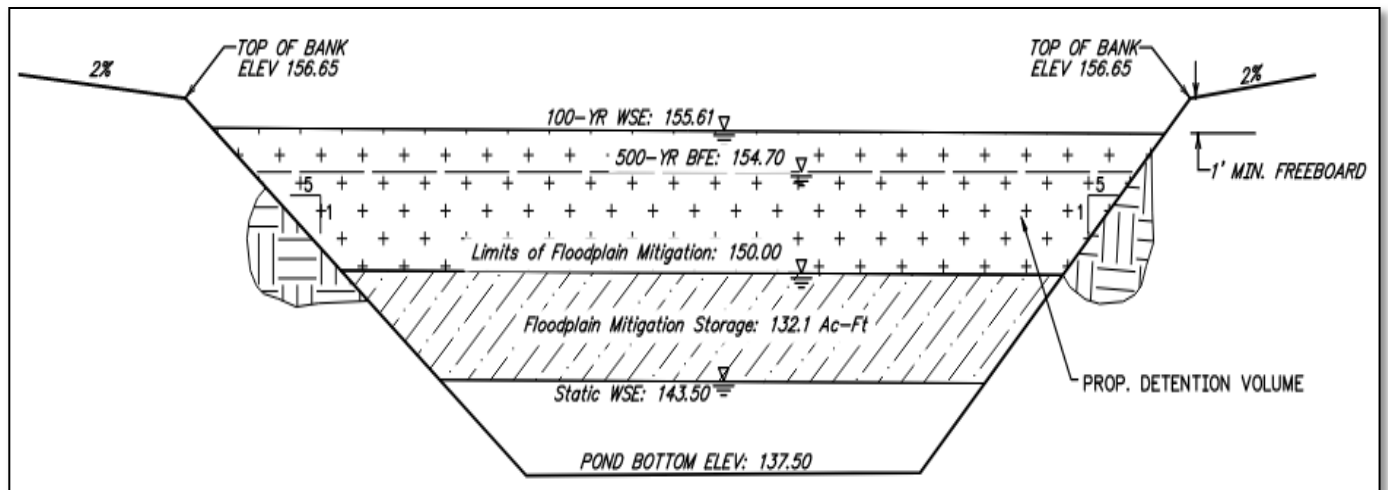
Typical Detention Pond Cross Section with Floodplain and Development mitigation storage
